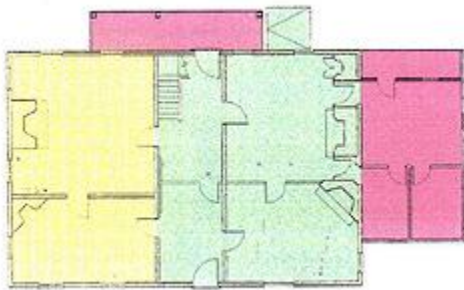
Conjectural floor plan for the first floor of the Jacobus Vanderveer House following the removal of the 1770s kitchen wing and the construction of the new Kitchen Wing. The areas shaded pink depict the changes. The small front porch sheltering the front door on the south side. HSR, I, p. 4-16.
